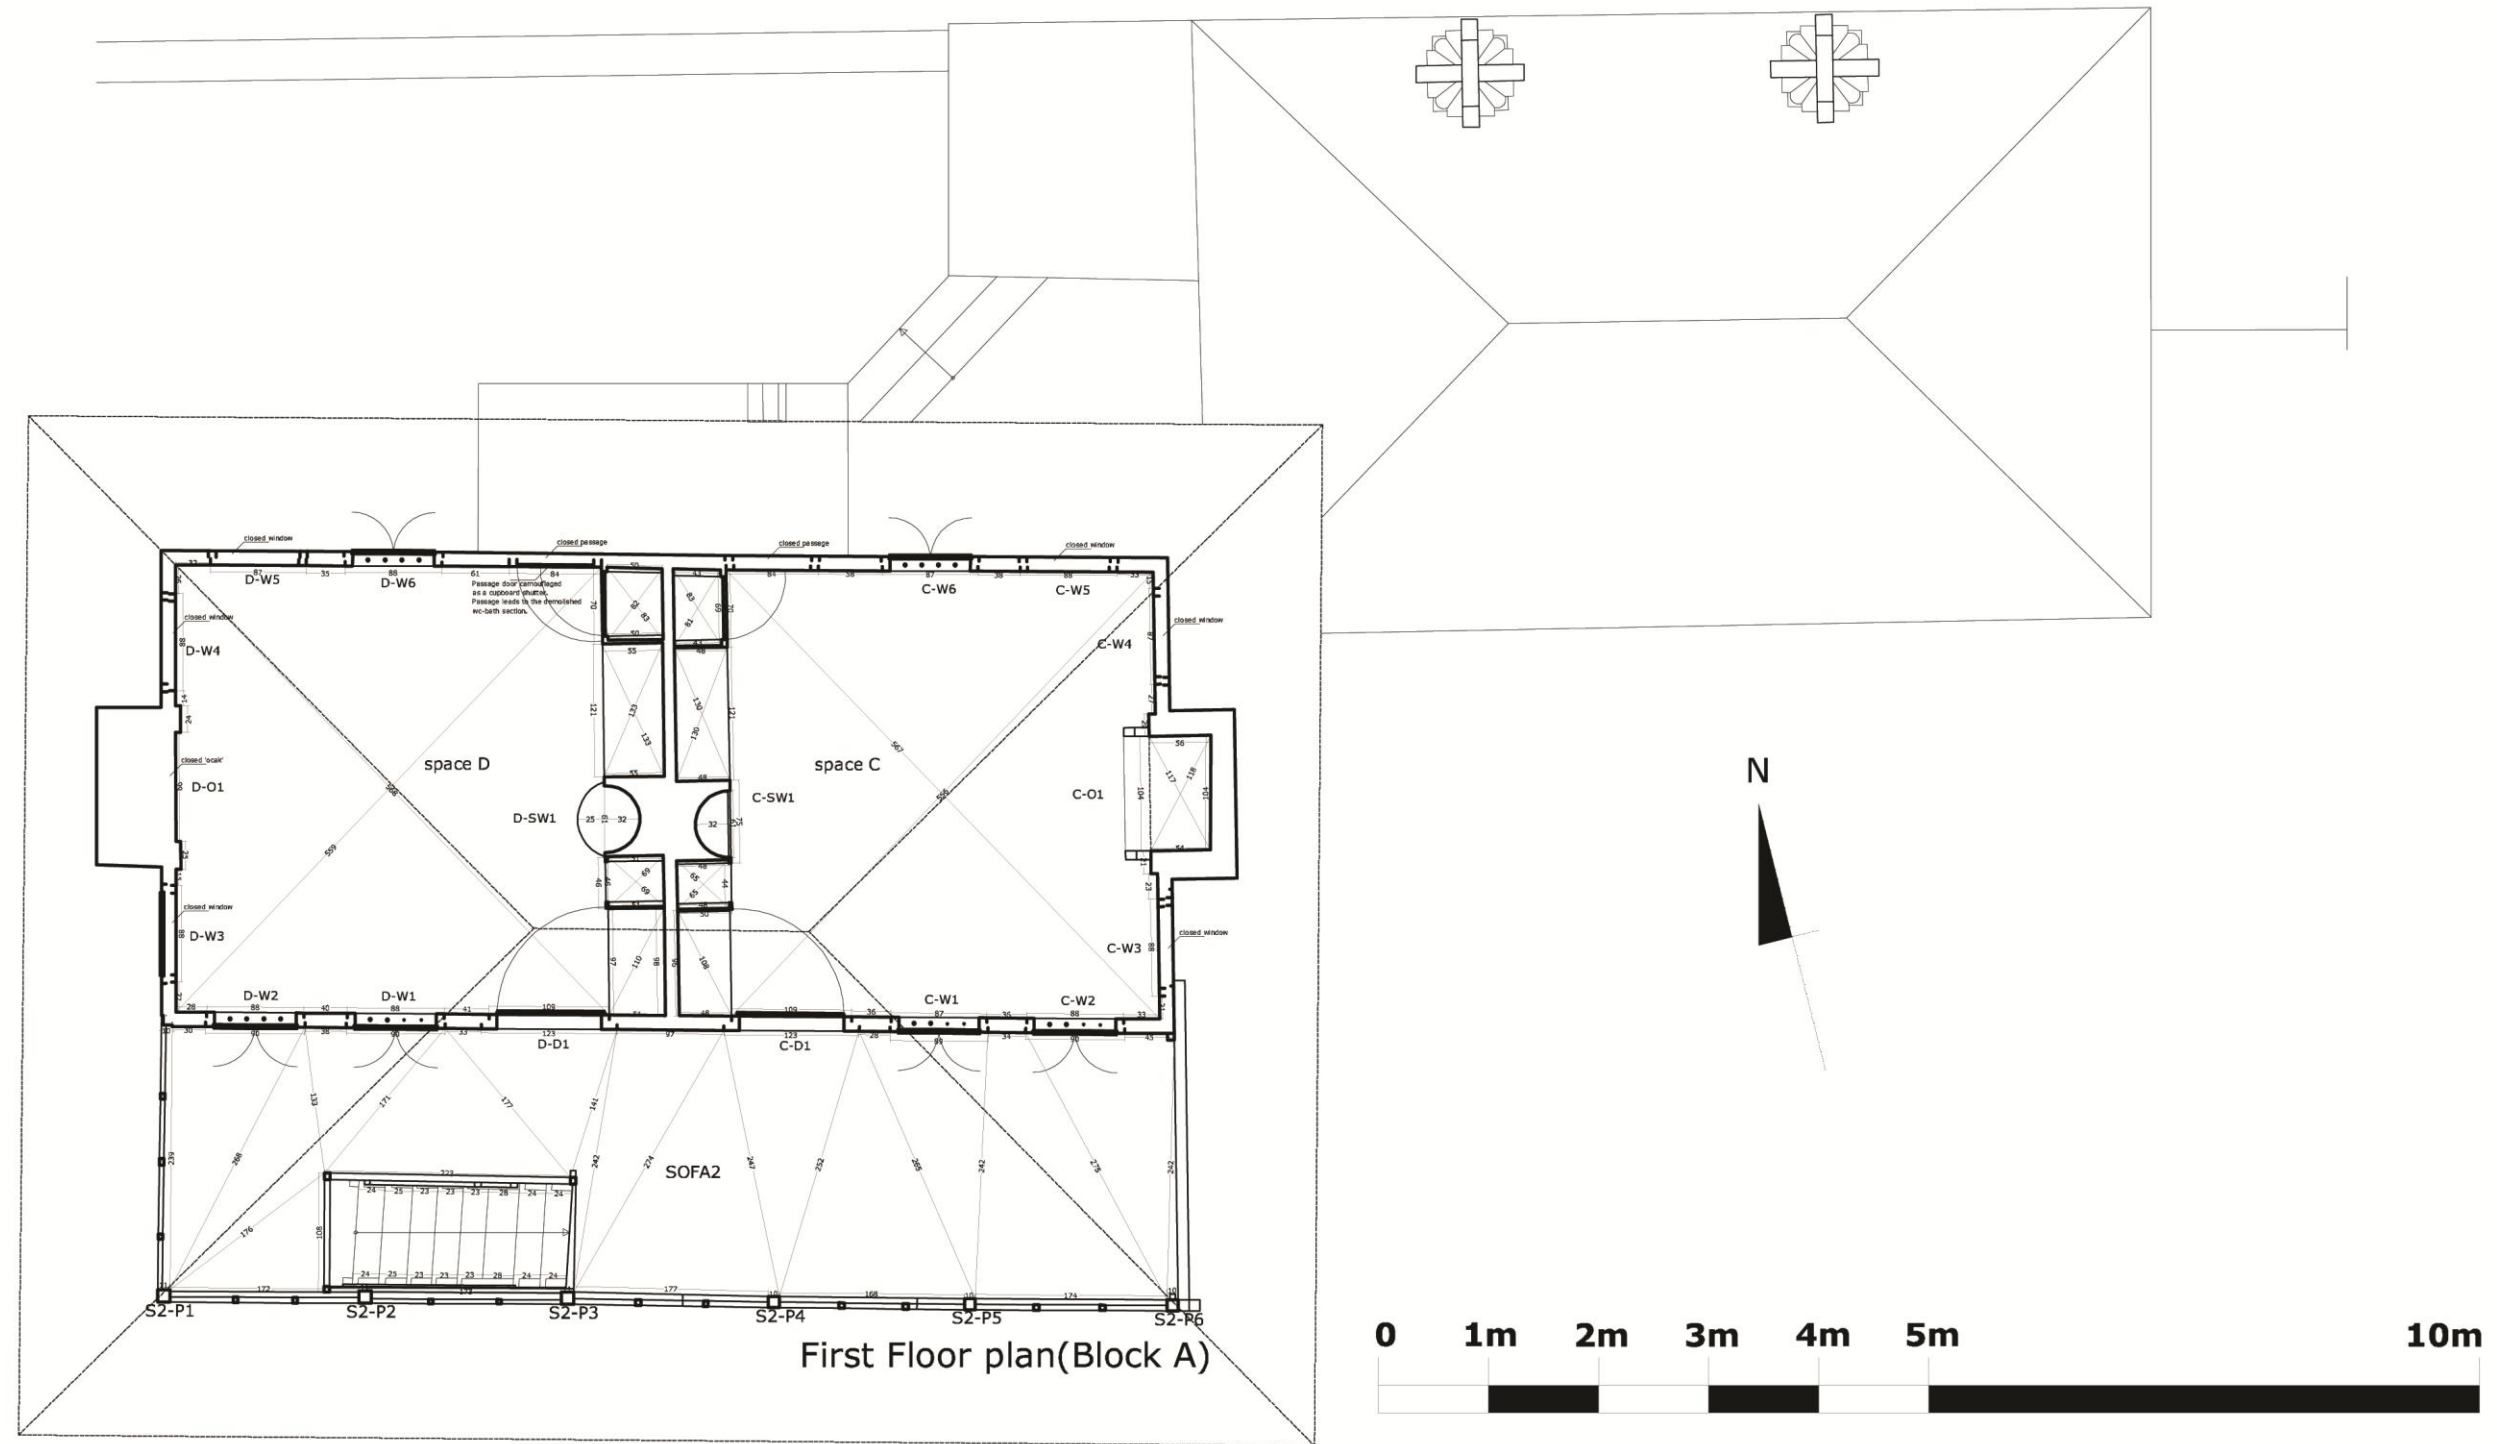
First floor plan of Block A in the *yurt* of Köseoğlu Family
